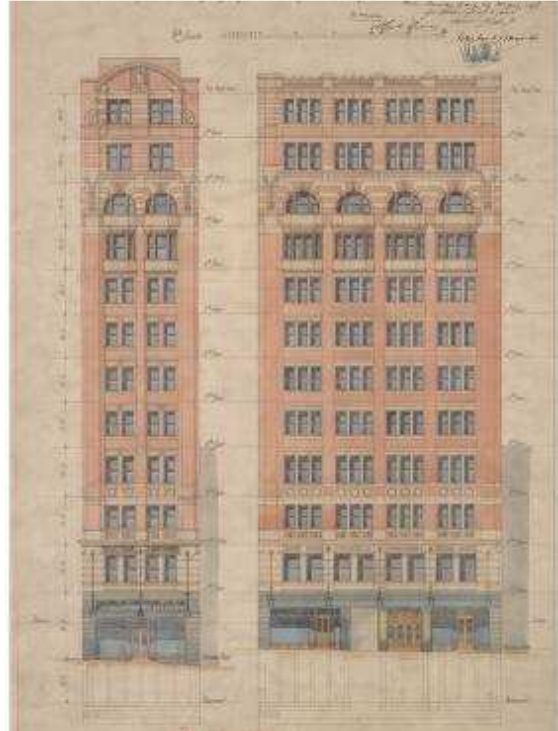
Original plan showing the King and Castlereagh Street elevations of the Culwulla Chambers building.
